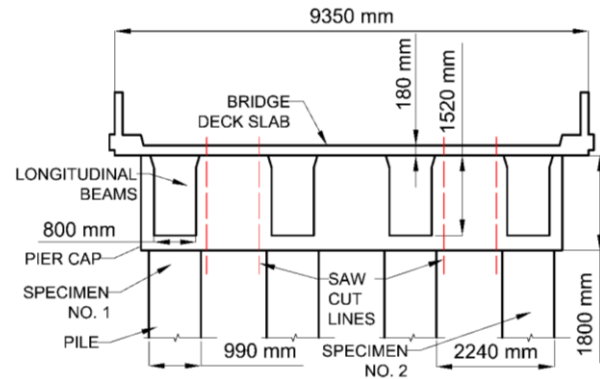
Section view of the Henderson Creek Bridge pier dimensions, including the location of saw cuts used to separate each extended pile-column for testing.
